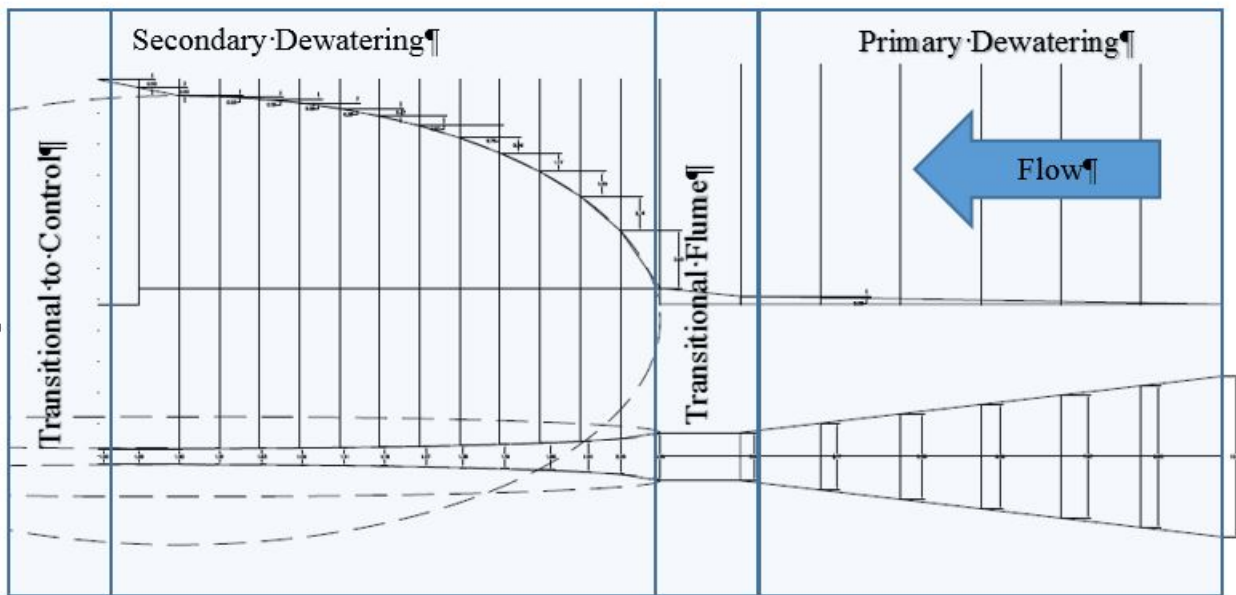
Elevation and Plan View of Dewatering Schematic
